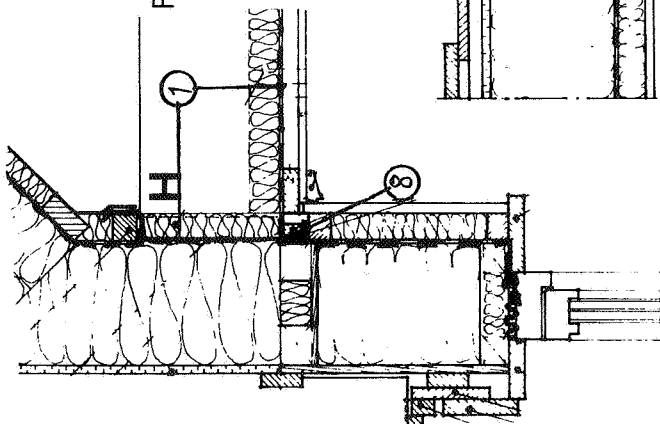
Vapour barrier if attic is heated. Vapour barrier 50 mm behind inner sheet. Wall section, outer corner and joint between walls
